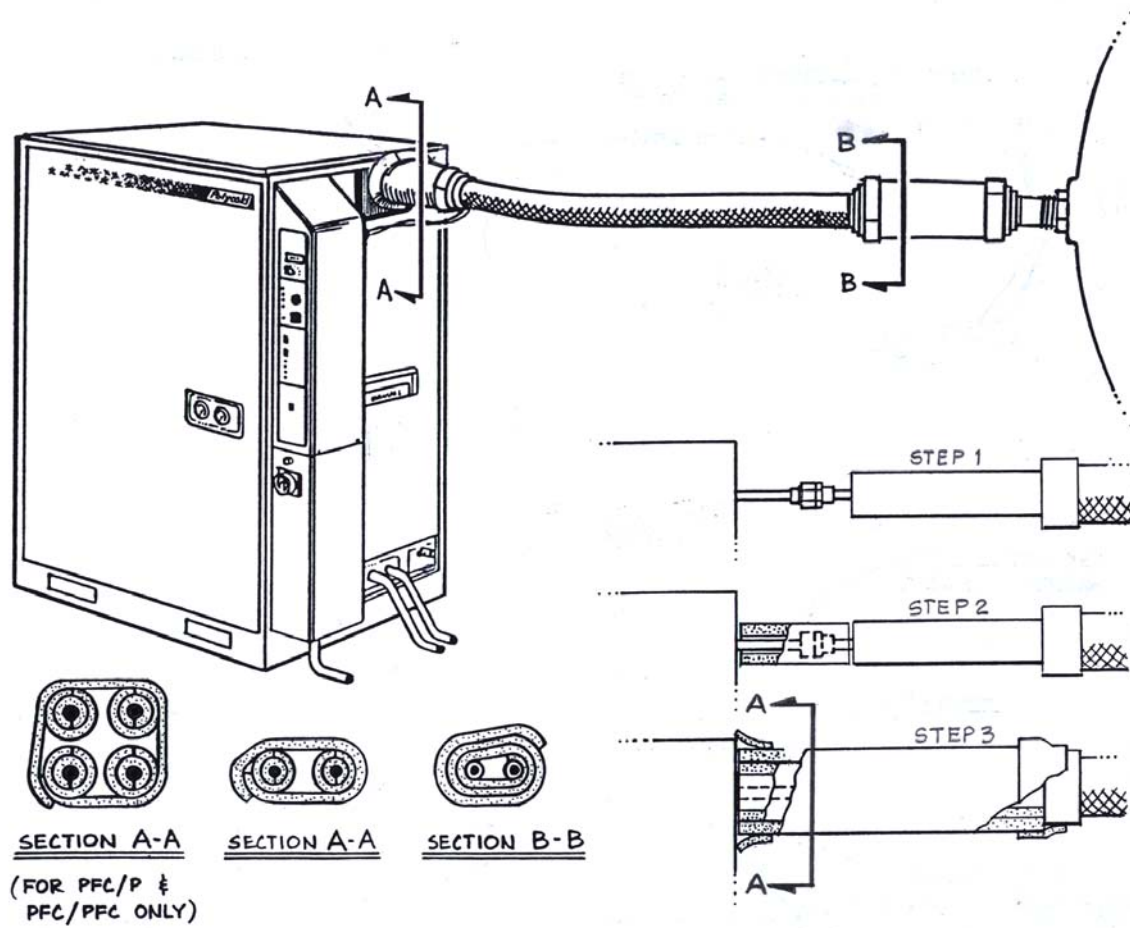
Insulating Exposed Tubes and Couplings Method
